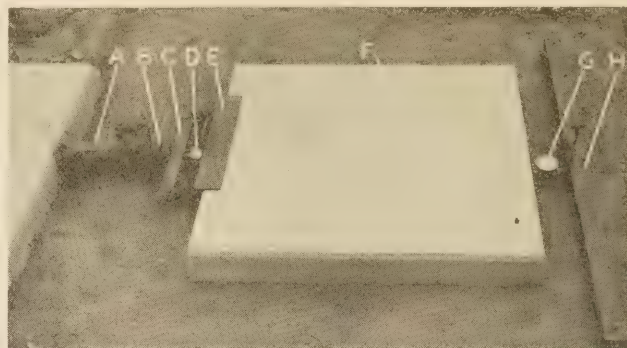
APPARATUS USED FOR DETERMINING THE RESISTANCE OF THE SUBGRADE TO HORIZONTAL MOVEMENT OF THE PAVEMENT.
